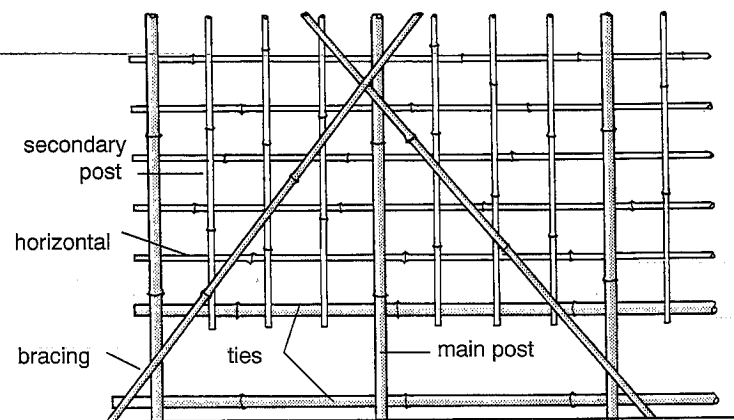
Typical scaffolding arrangement (after Fu, 1979)
